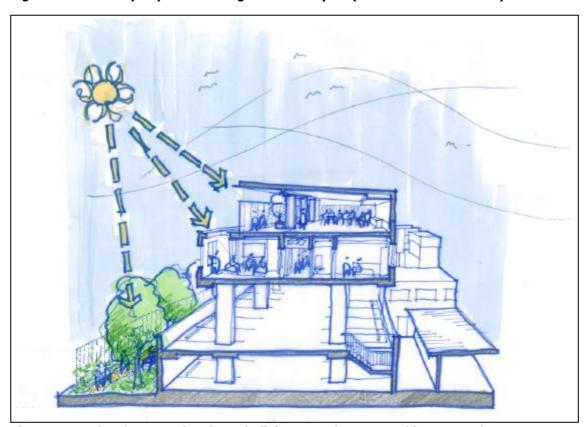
Sectional perspective through dining room (Team 2 Architects 2021)
